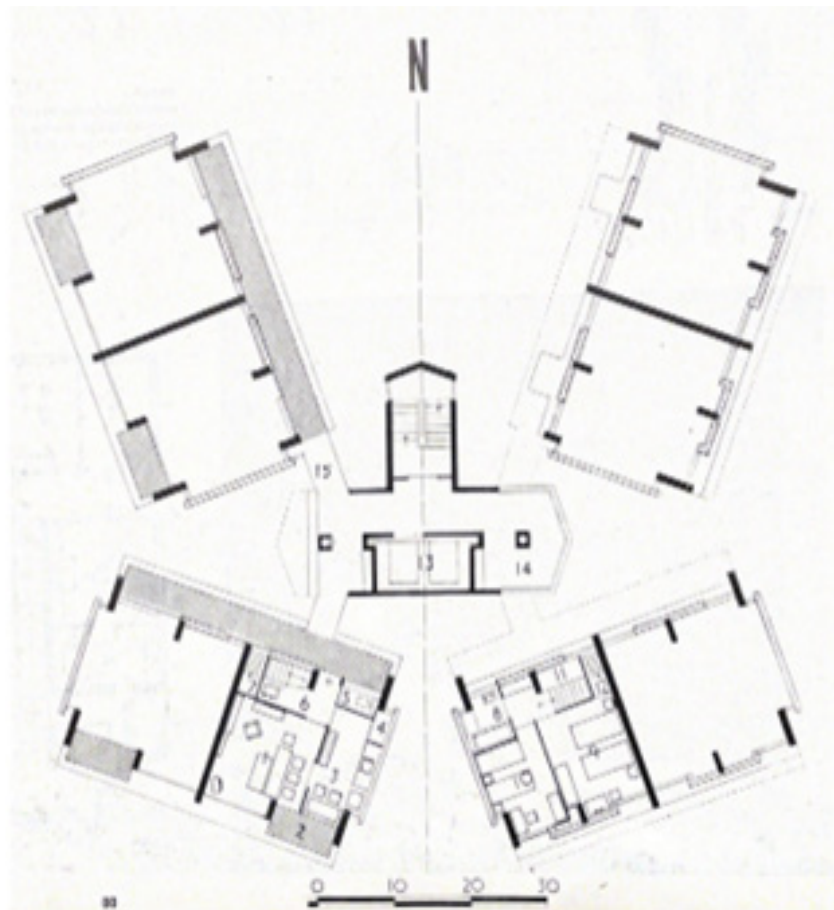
Keeling house 'cluster' floorplan highlighting the interior and balconies of units
